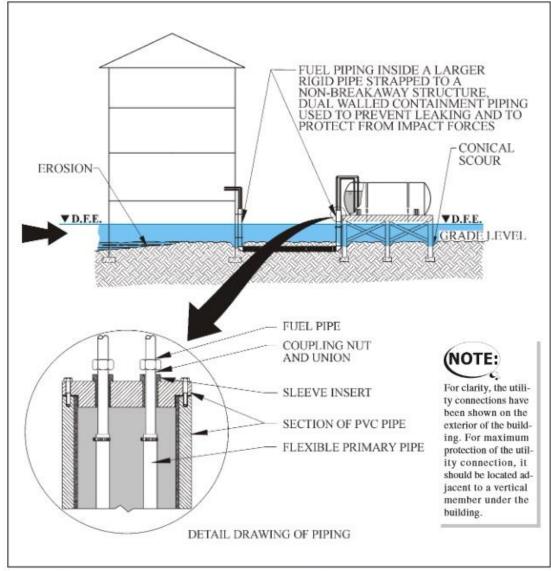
B: The vertical runs of fuel piping embedded in utility shafts strapped to non-breakaway structures
